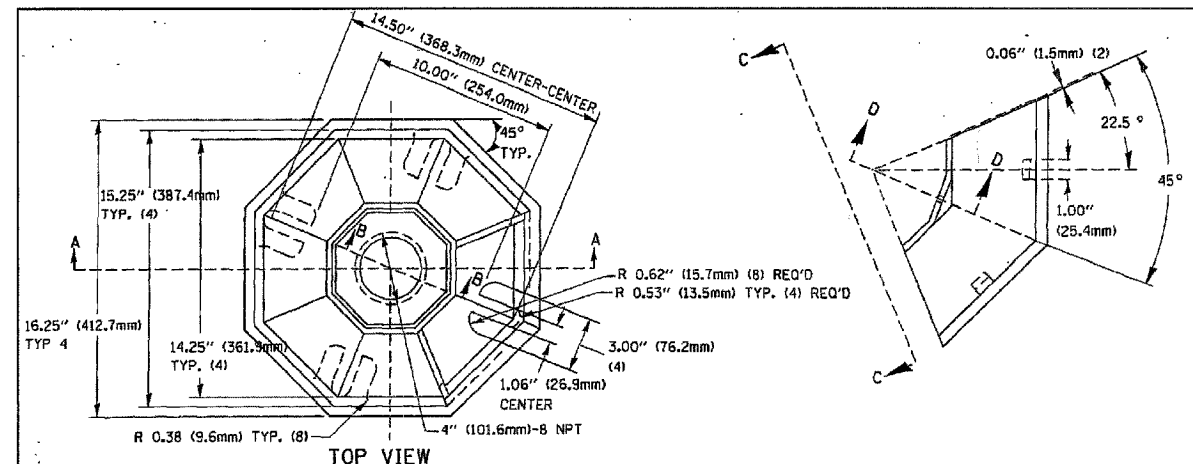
DETAIL HANDHOLE TO INTERCEPT EXISTING CONDUIT N.T.S.
